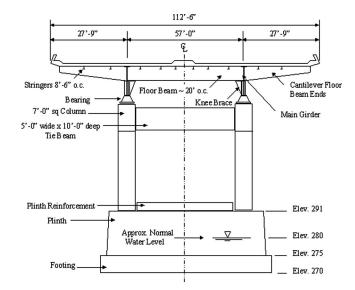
Pier of Schoharie Creek Bridge (WJE/MRCE 1987)
